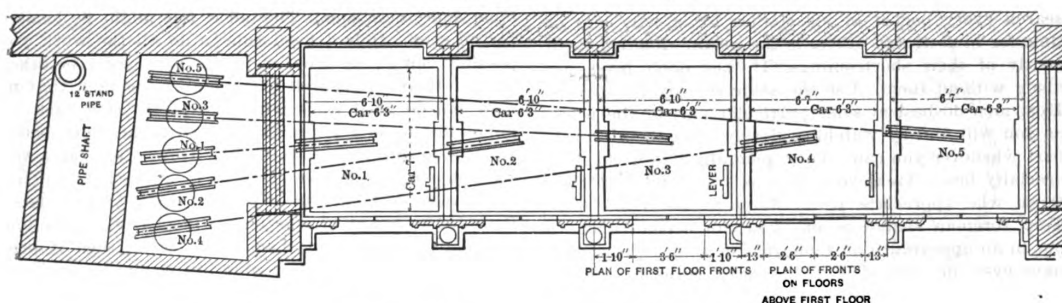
Sectional Plan of Half of Elevator Shafts on Main Floor.
